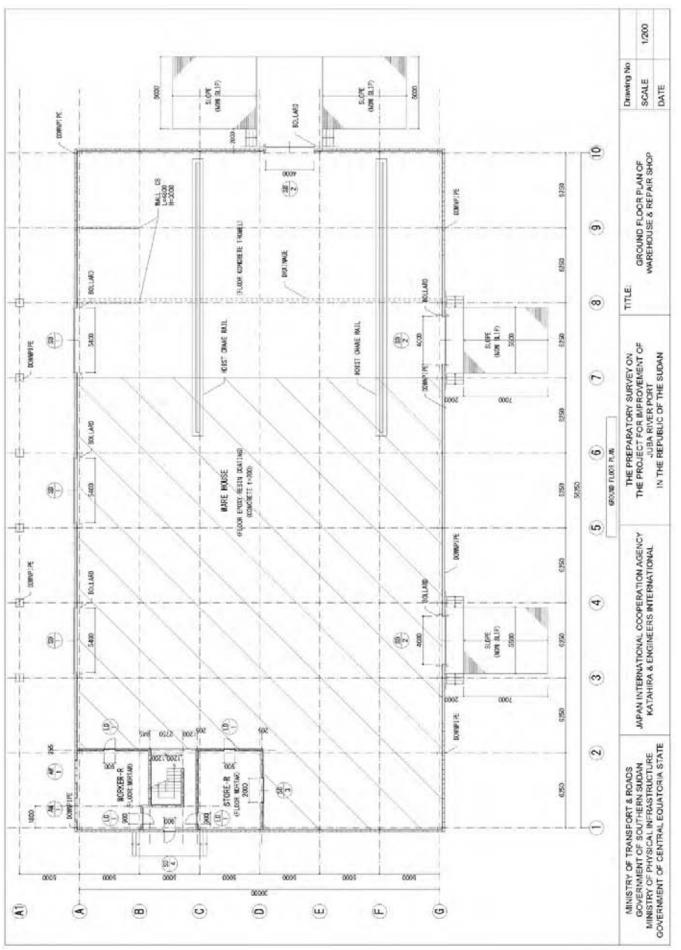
Ground Floor Plan of Warehouse & Repair Shop
